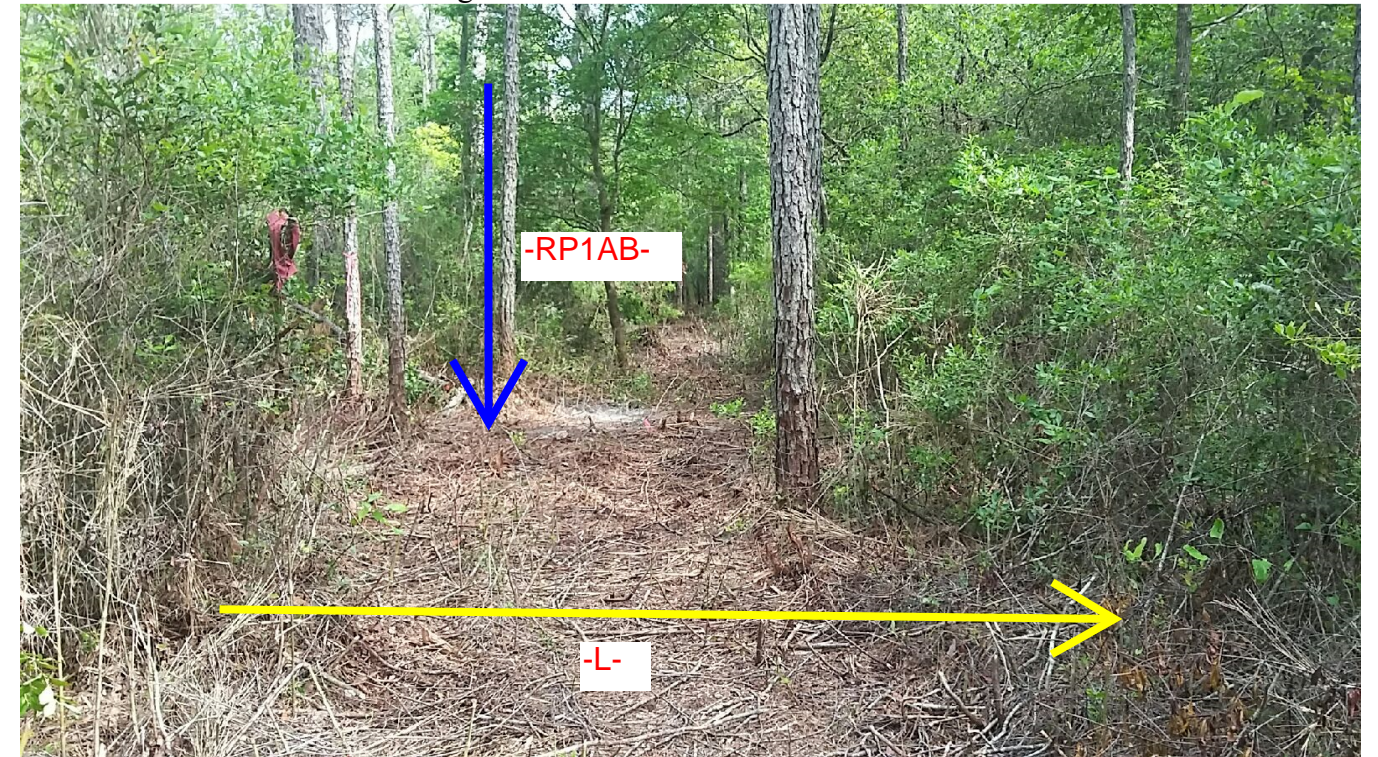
Looking towards End Bent 1 and down station of -RP1AB-
